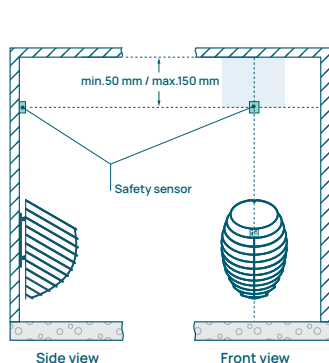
Installing the safety sensor on the wall: wall-mounted heater
